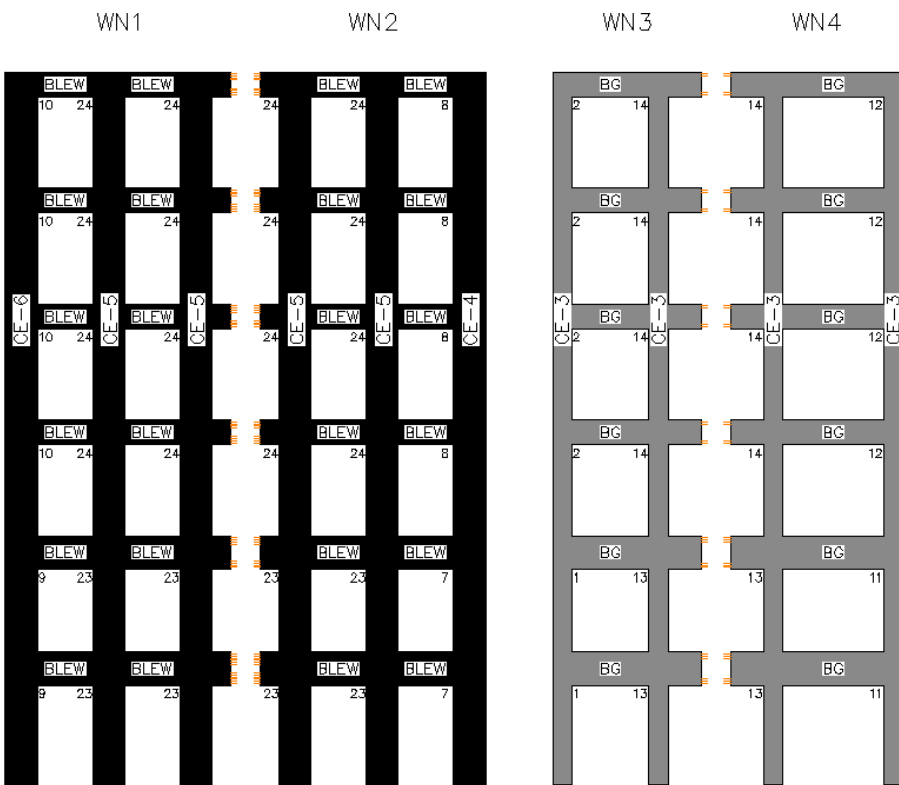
, Joint Locations and Respective West Tilt-Up Wall Panels Designations
